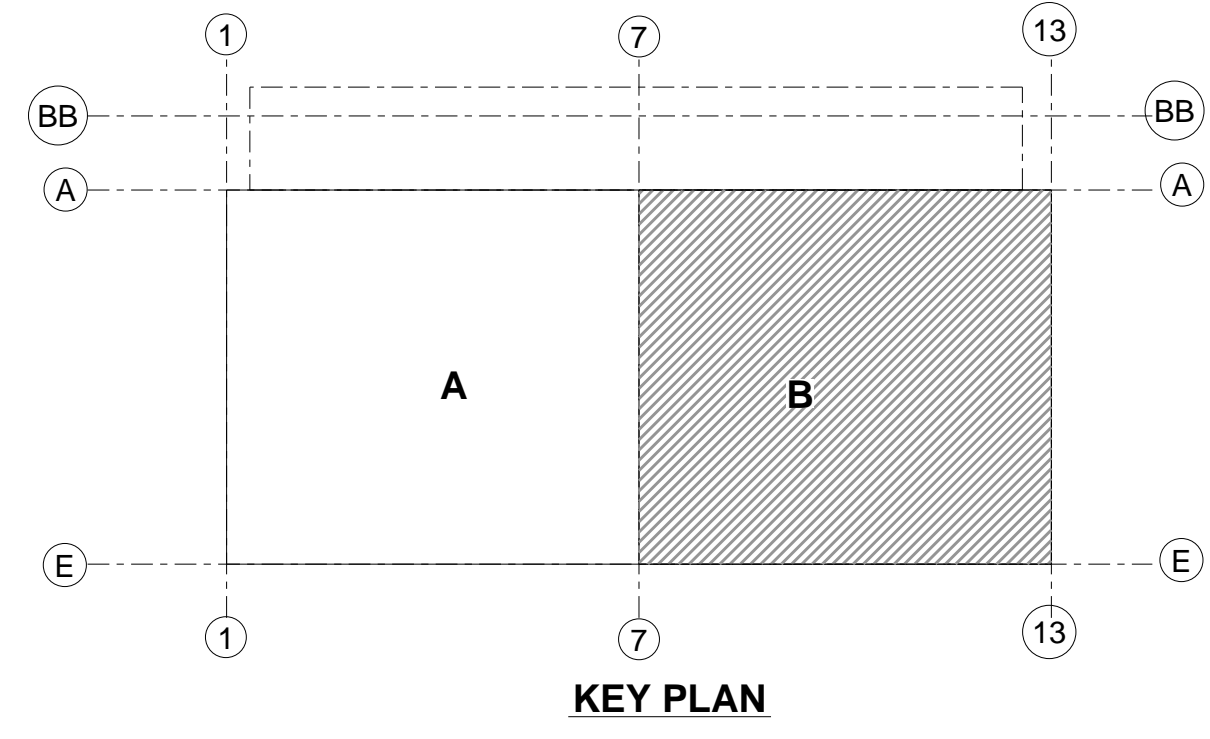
DETAILS OF : PARTIAL EMBED SETTING PLAN AREA A REF. DWG. NO :
